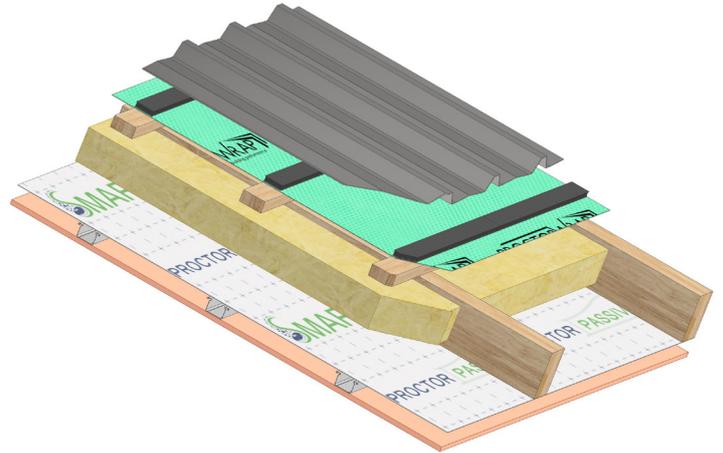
Where the sarking is installed above roof battens, the ProctorVent DB-FR drainage batten is installed above the sarking to create a free path for drainage and ventilation.
